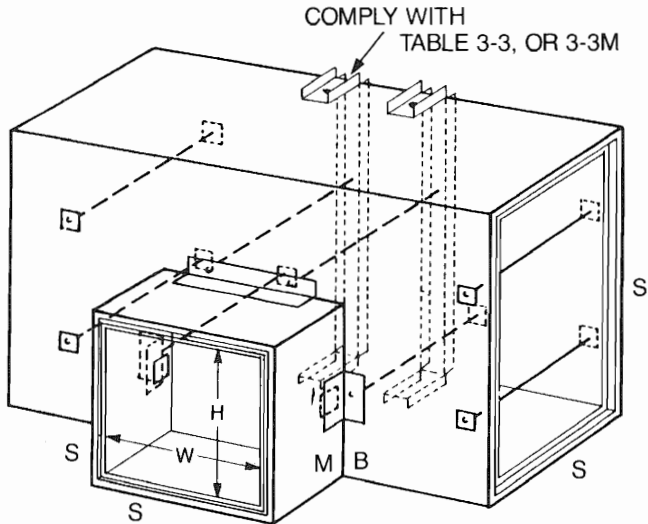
TRUNK DUCT REINFORCEMENT WITH 3" CHANNELS
